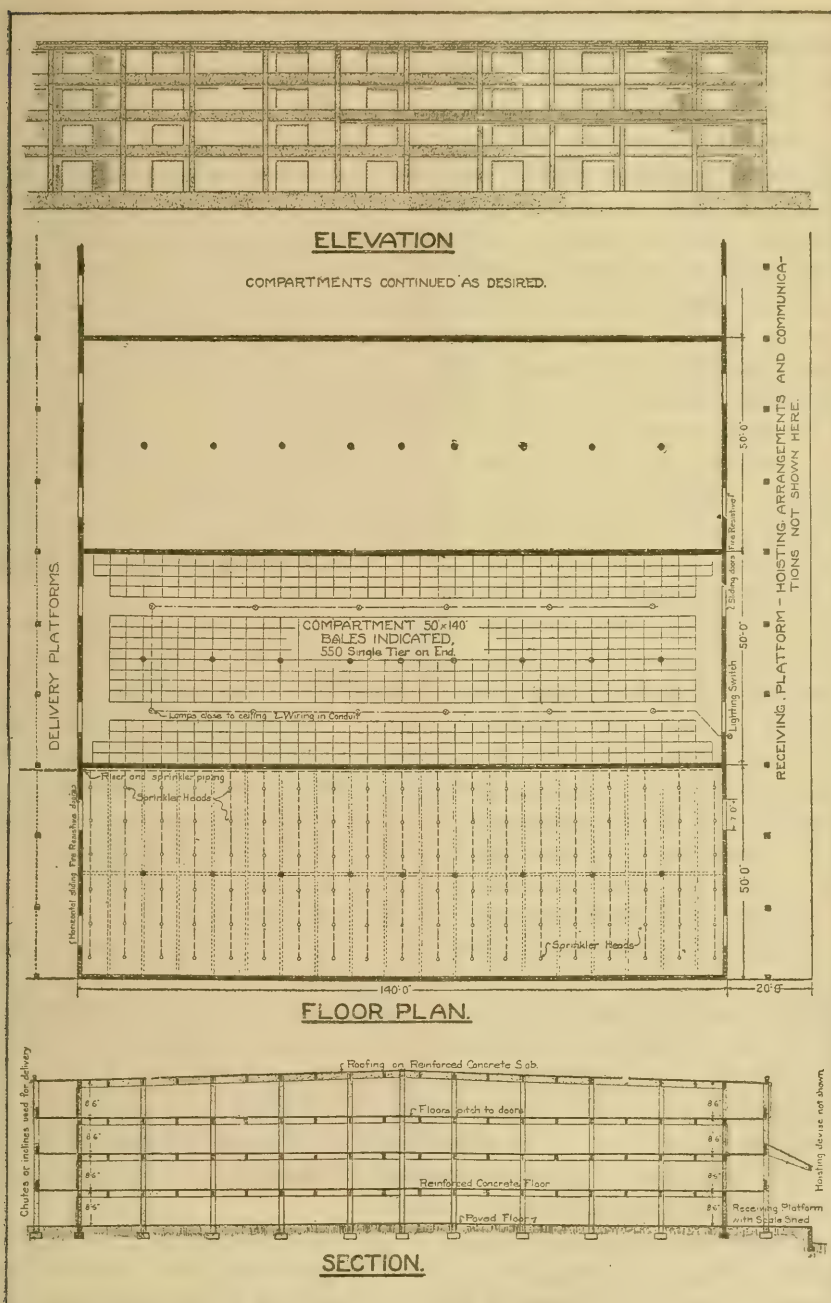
A warehouse design suitable for construction of reinforced concrete, or which may be used with timber floors if equipped with automatic sprinklers.
